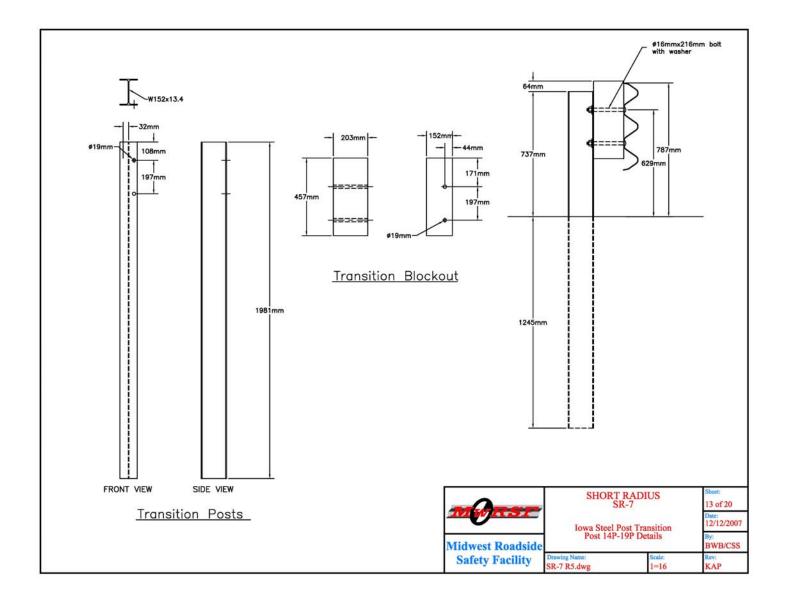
Iowa Steel Post Transition, Post Nos. 14P-19P Details
